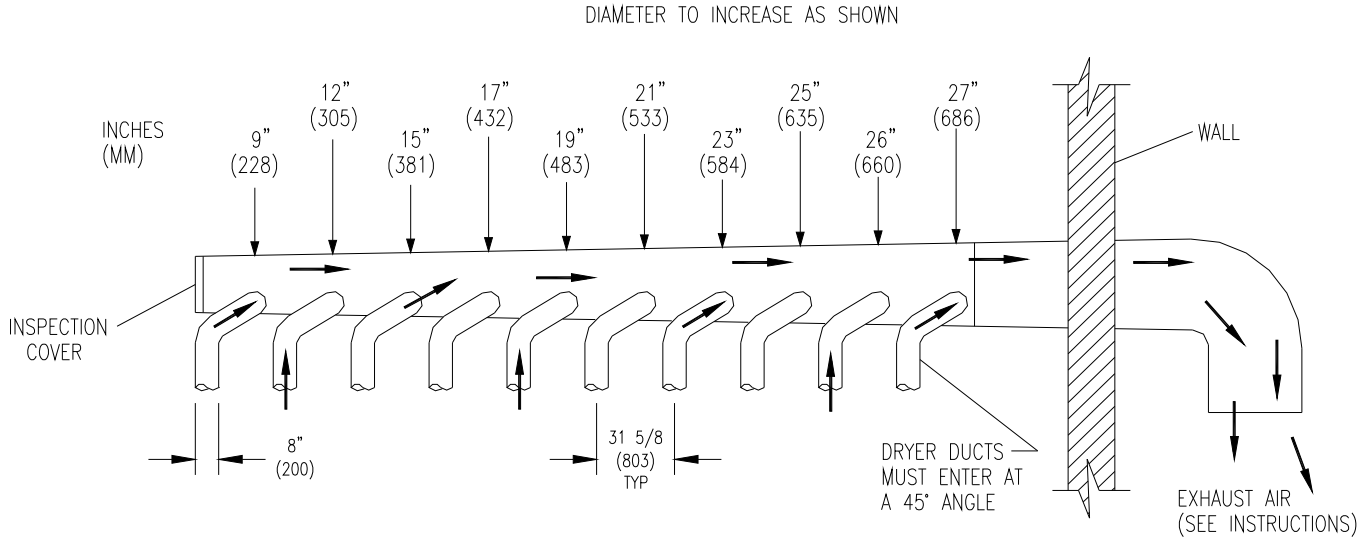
Dryer Exhausting Using A Main Discharge Duct.
